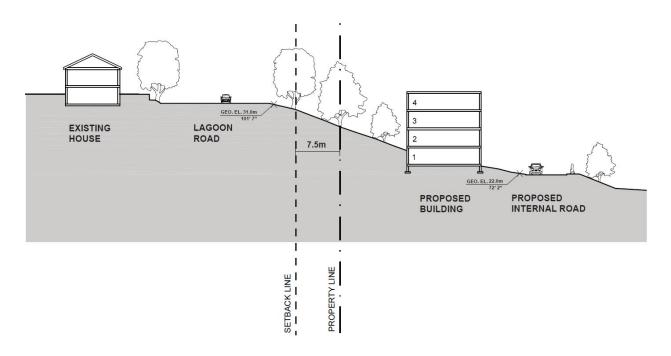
Section through 4-storey building along Lagoon Road looking north
